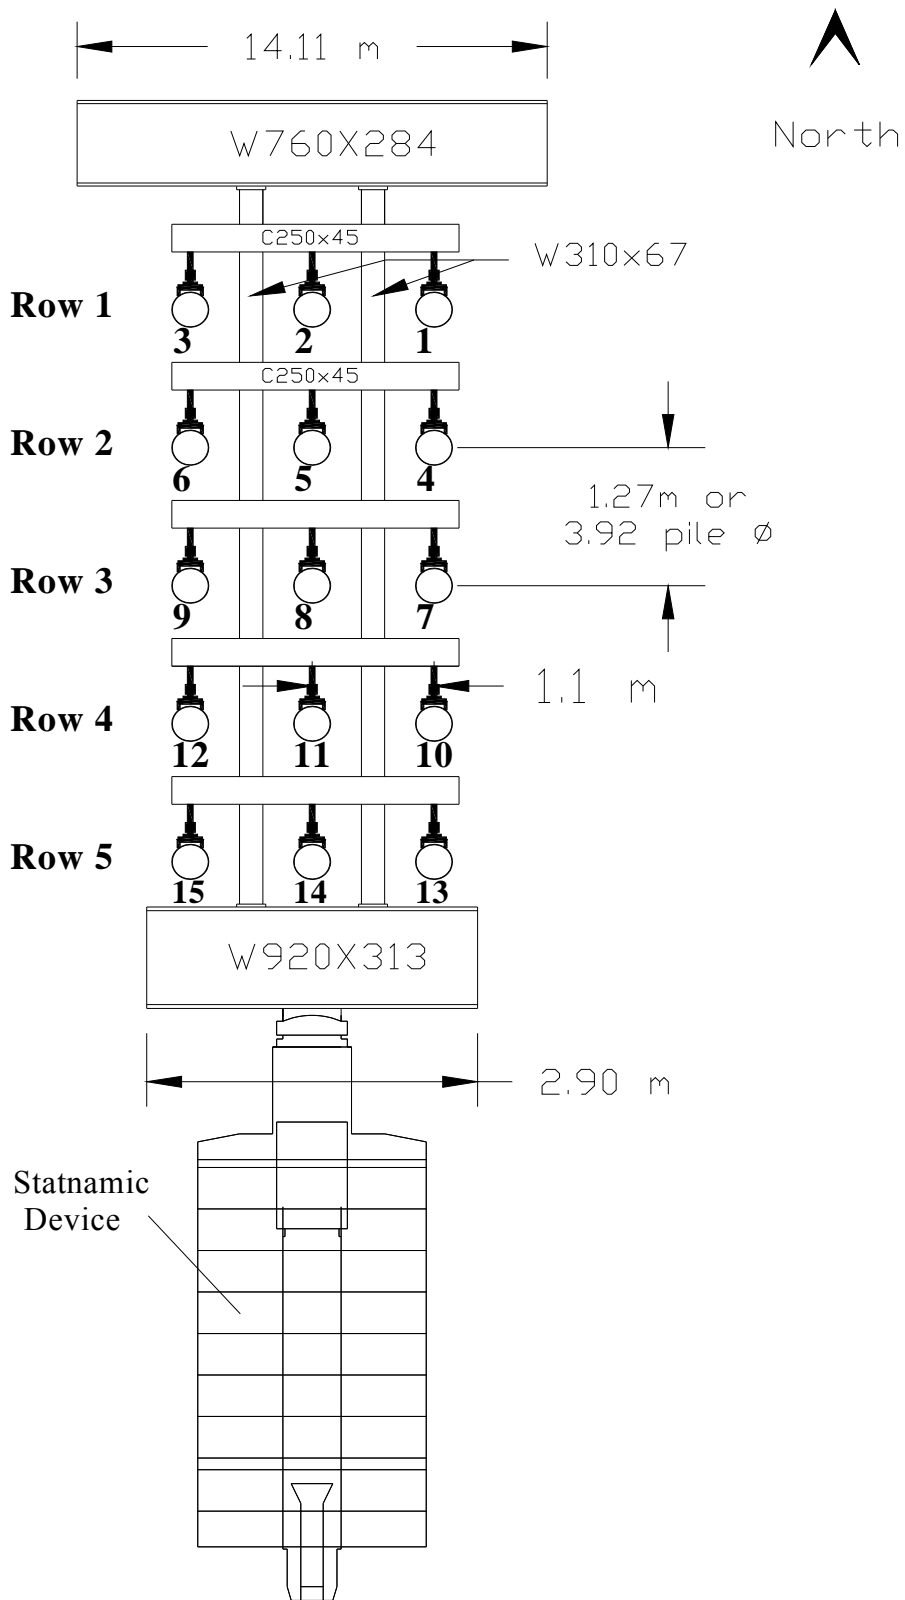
Plan view of 15-pile group layout under static testing with pile and row numbering.
